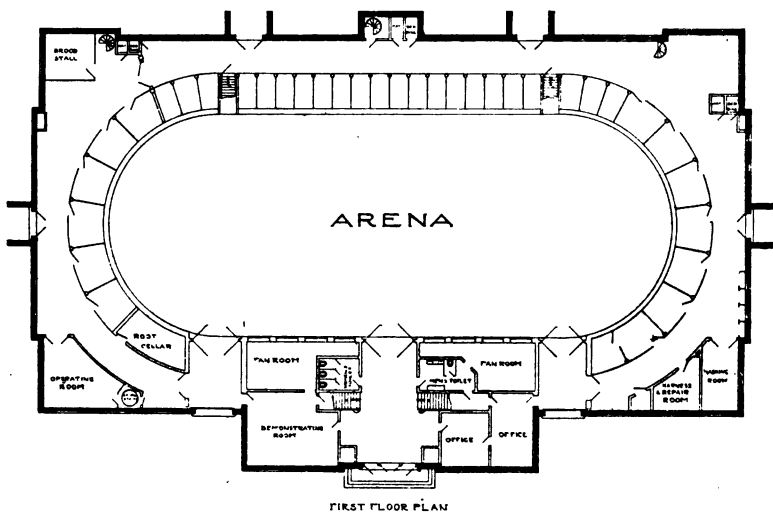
First floor plan of the live stock pavilion, showing stabling arrangements and offices.
